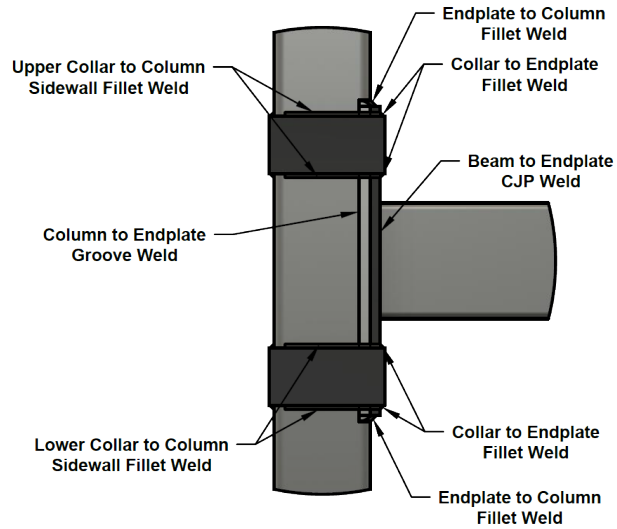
Required welds for the HSS-based collar connection without beam endplate stiffeners.
